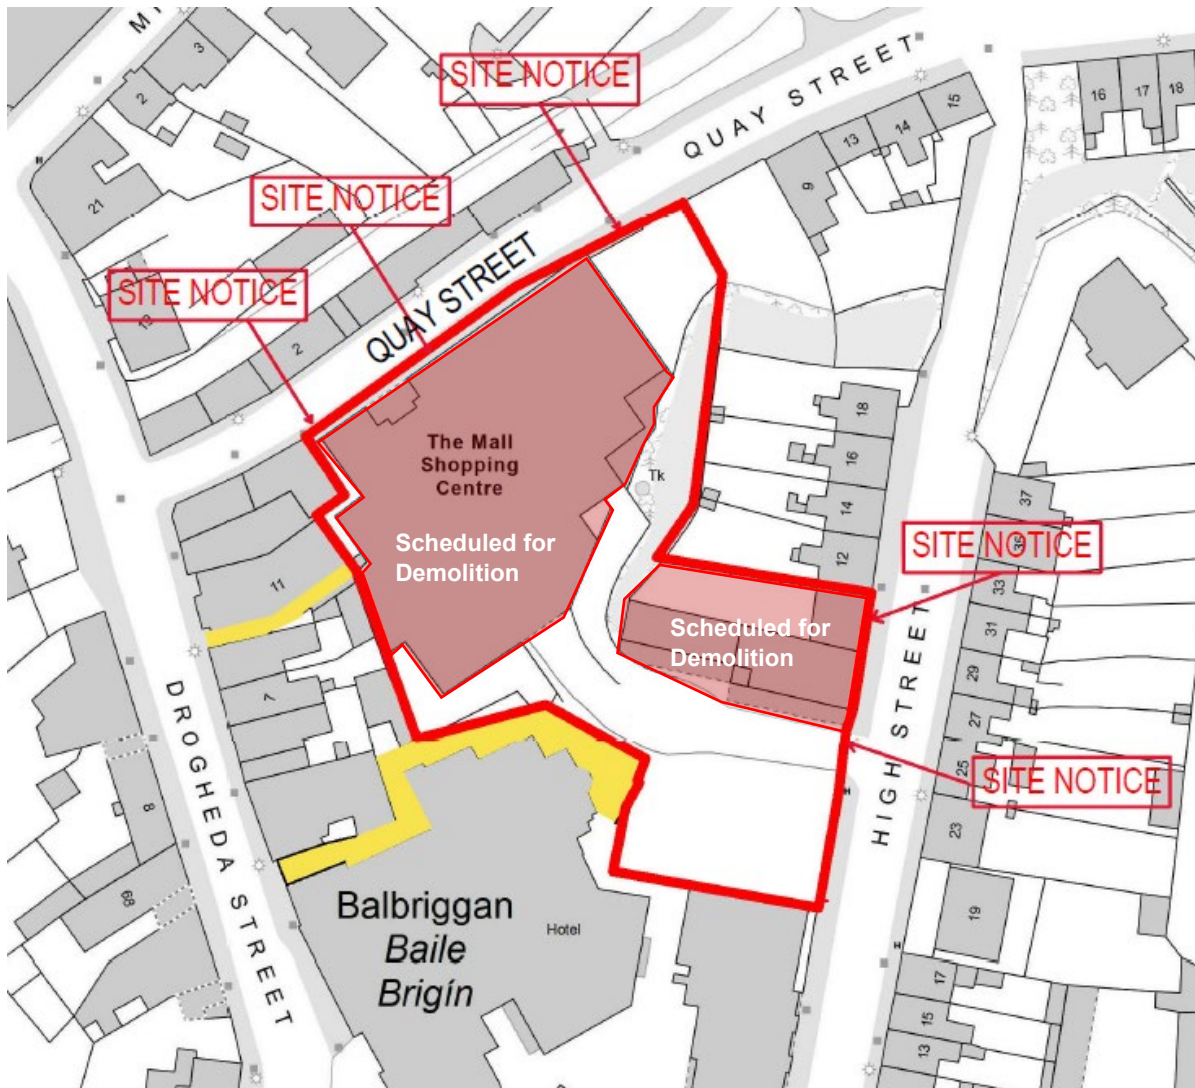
Existing Site Layout and Buildings Scheduled for demolition.
